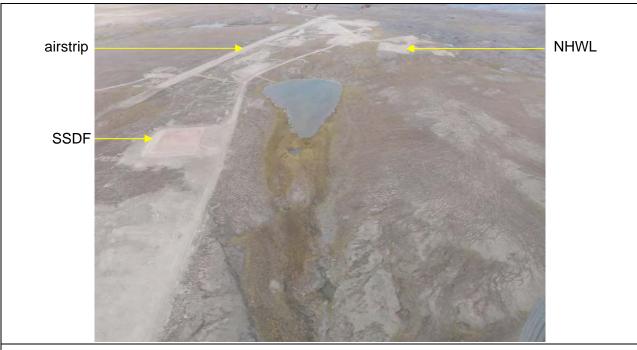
CAM-F DEW Line site showing the airstrip (upper left), SSDF (left, middle) and NHWL (centre, top). Direction photo taken: W (picture # P8240046).
